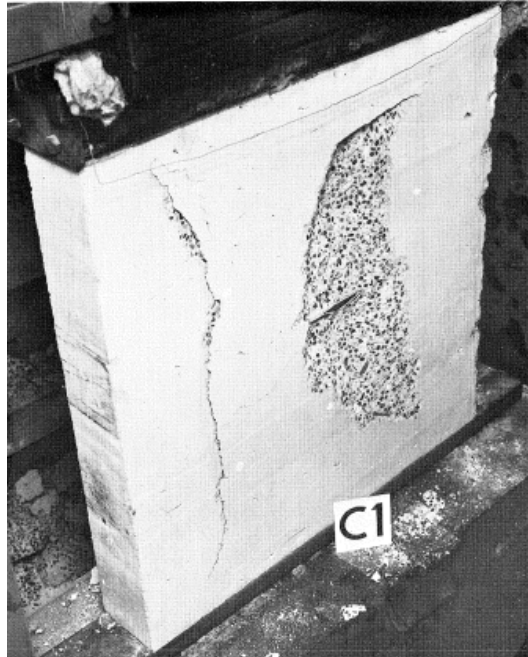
A slab specimen subjected to spalling due to exposure to fire (Copier, 1979)
